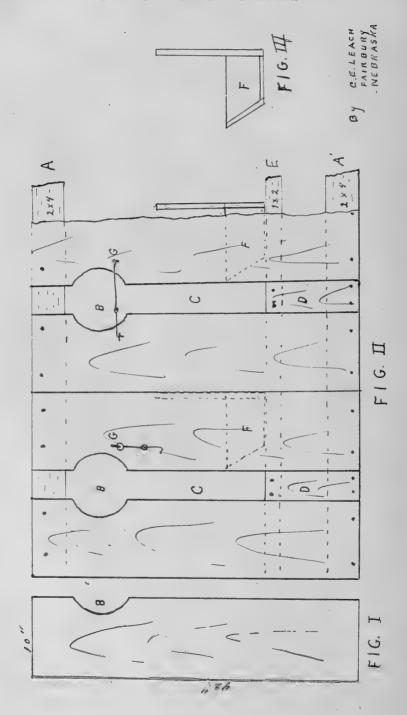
Fig. I shows a ten inch board cut to shape. A fourteen foot board, ten inches wide, cuts just right for four pieces.
